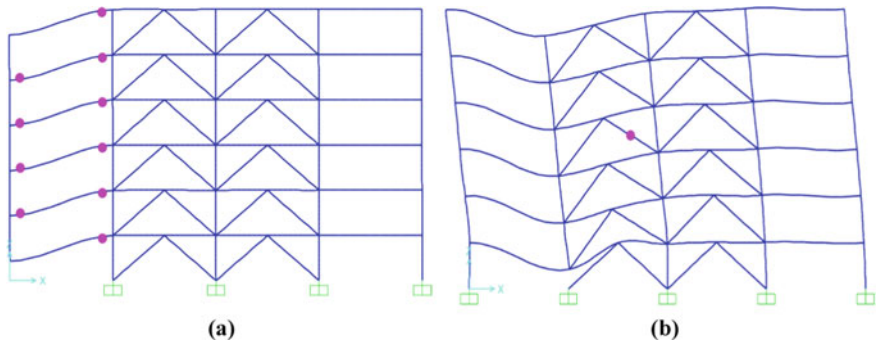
Plastic hinges formation in bracing system a corner column removal b second column removal
